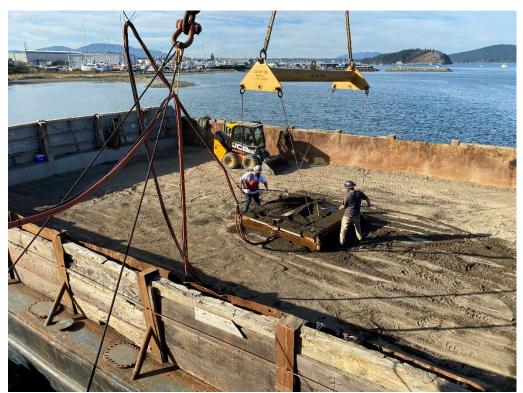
The steel table was filled using a small skid steer loader and then two deck hands used rakes to remove excess and level out the backfill to be placed
